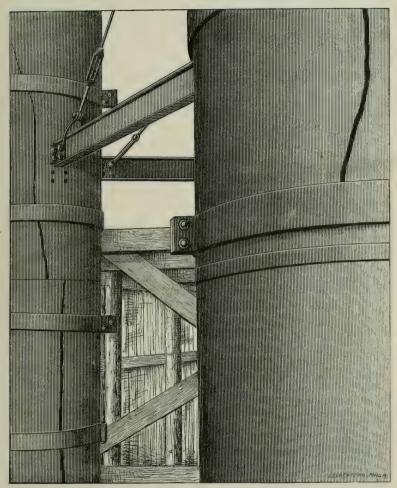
PLATE I. Exhibiting Cracks in Iron Columns.
